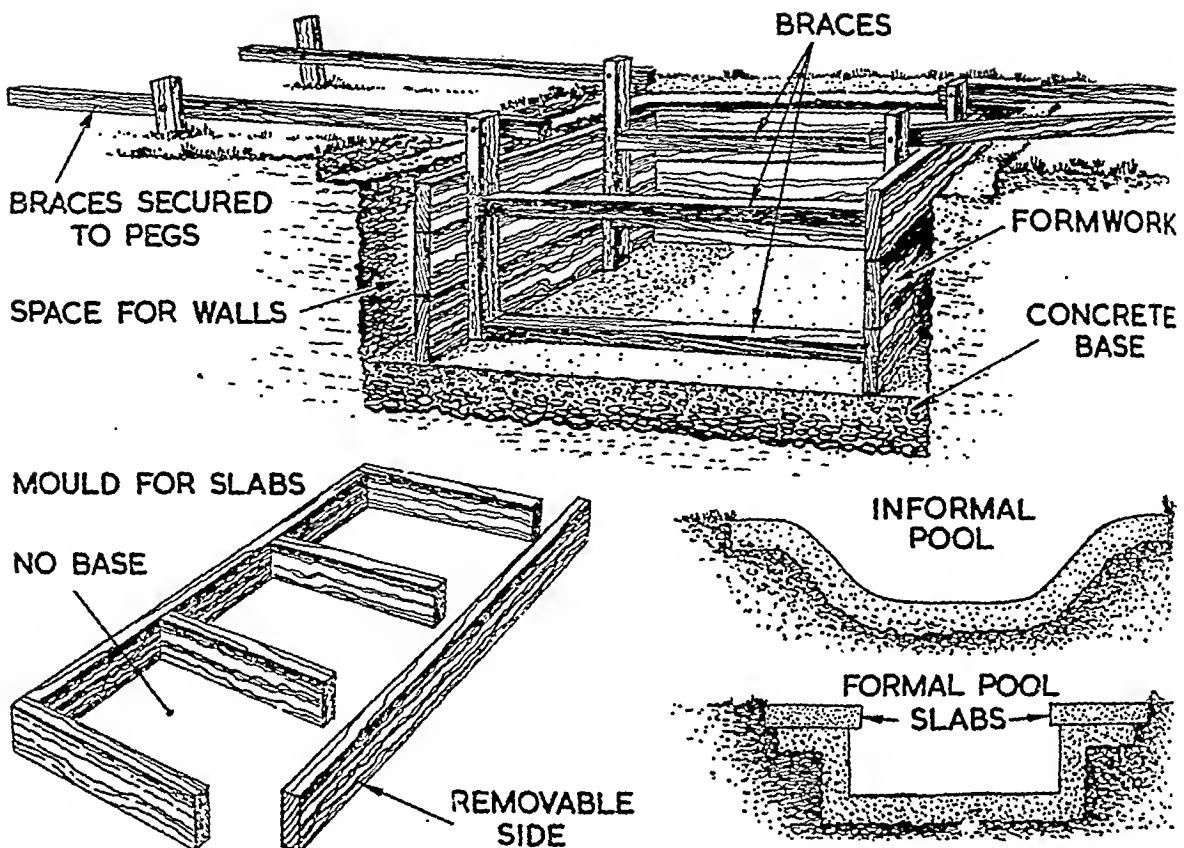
Moulding concrete slabs and cross-section of garden pools
